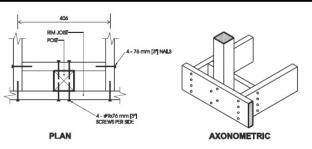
Exterior Connection: Top Rail Nailed to Post
